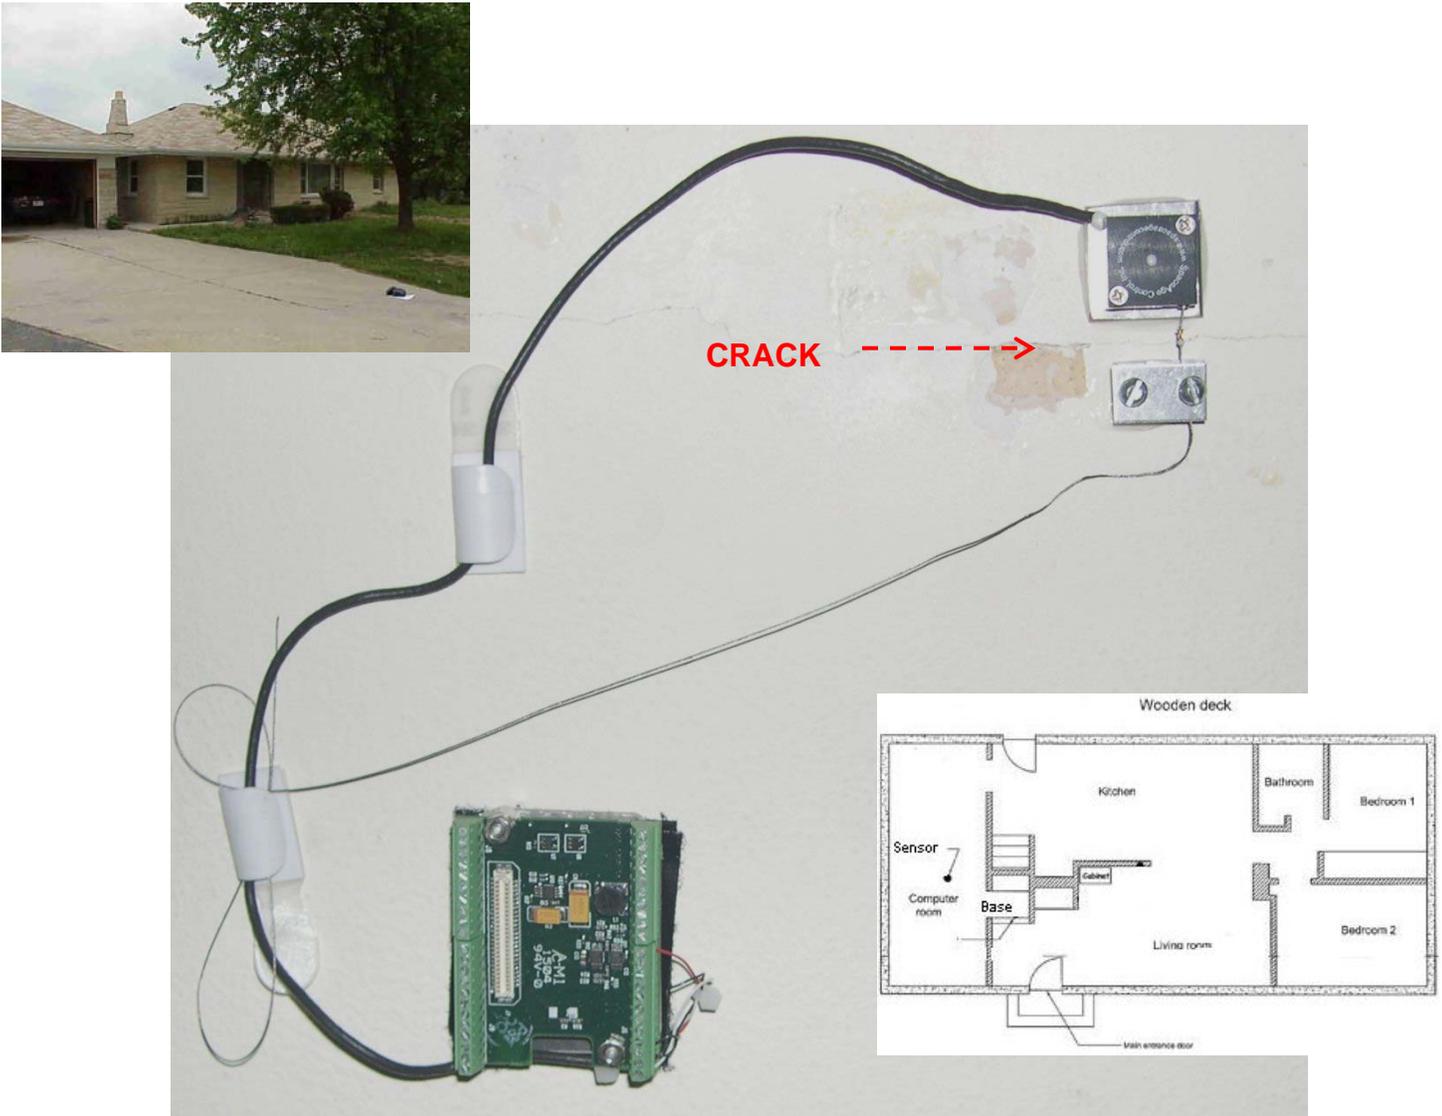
MDA300 and Potentiometer mounted over crack with plan view and picture of house
